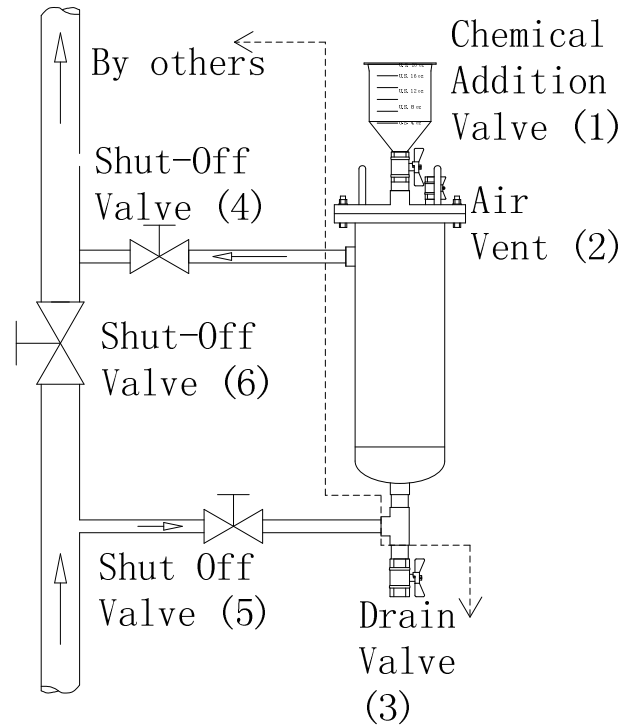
Installation method 2 – CBF-HP installed in parallel with the system piping
